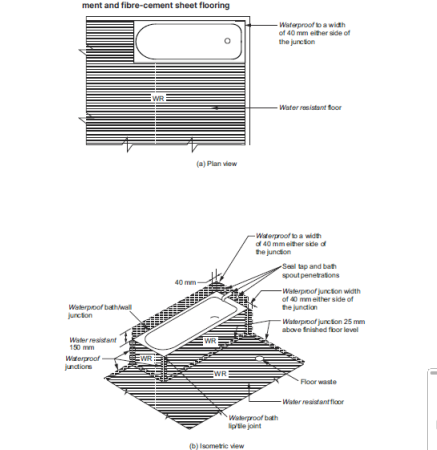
Bath and vessel abutting wall — areas to be protected
